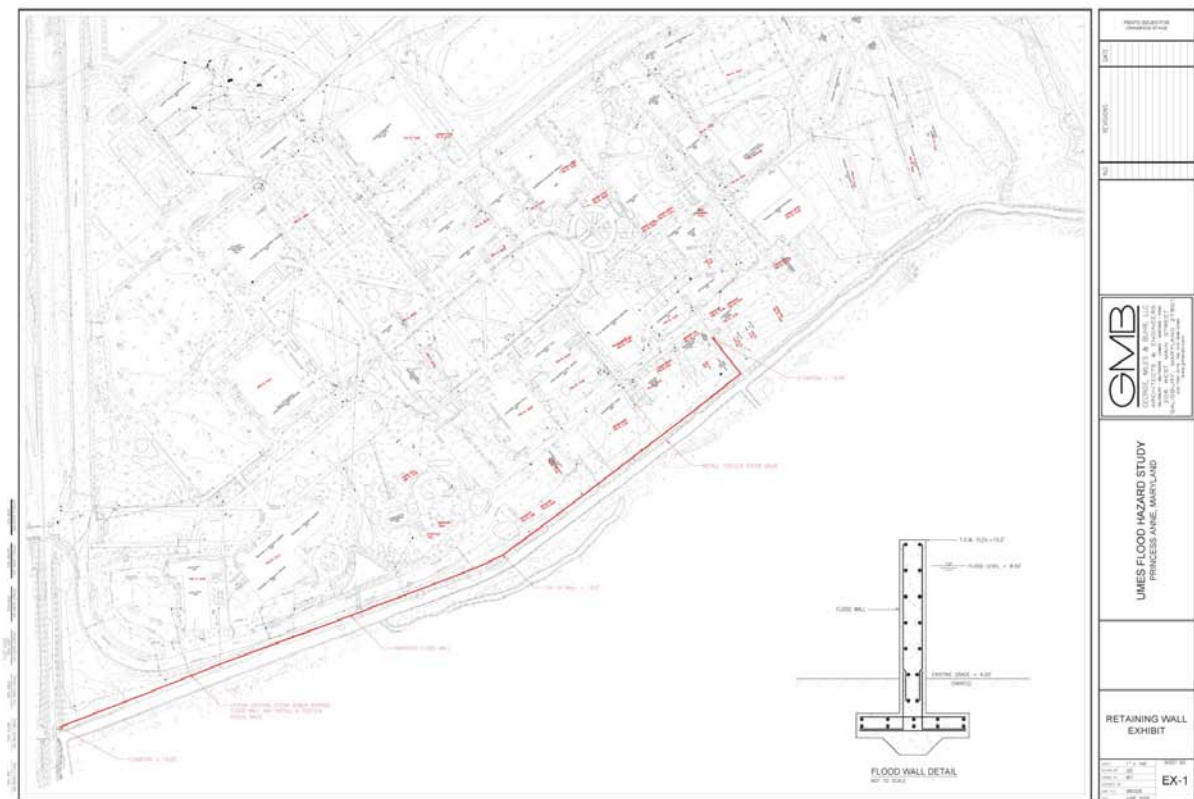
Limits of conceptual floodwall - top of floodwall elevation 10.0 feet
